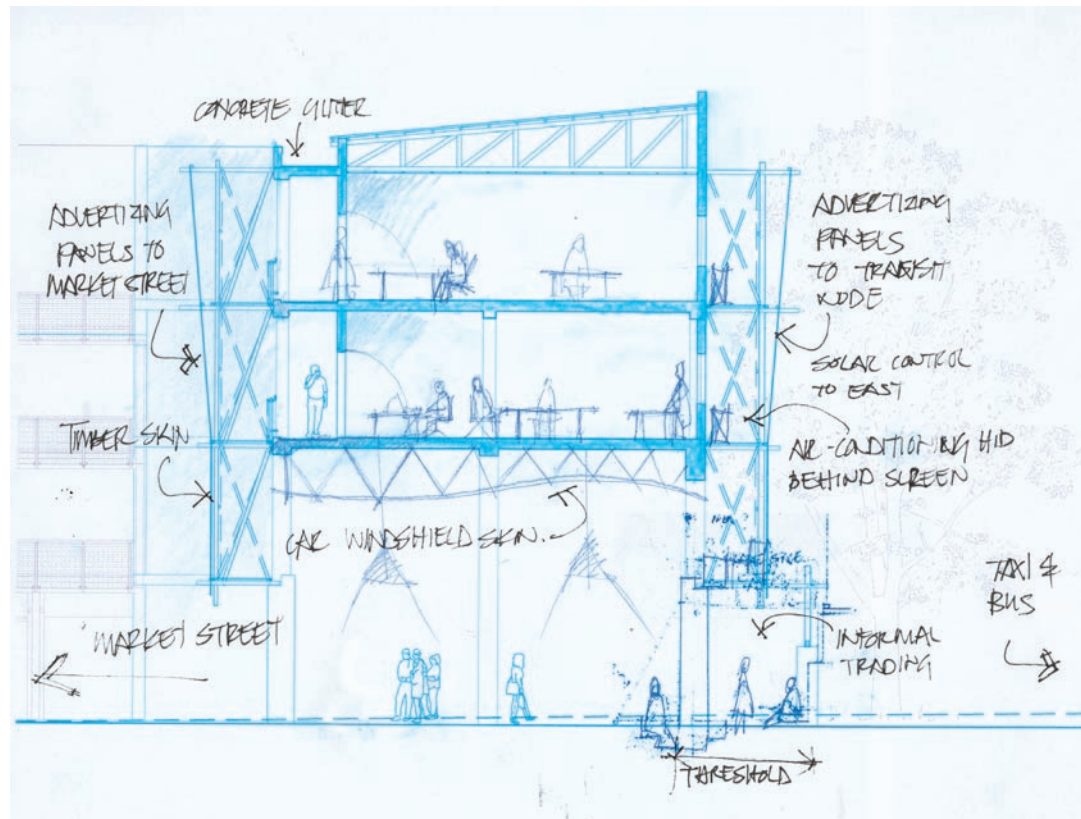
Below: Preliminary eastern elevation, depicting the use of the sun-screen system
